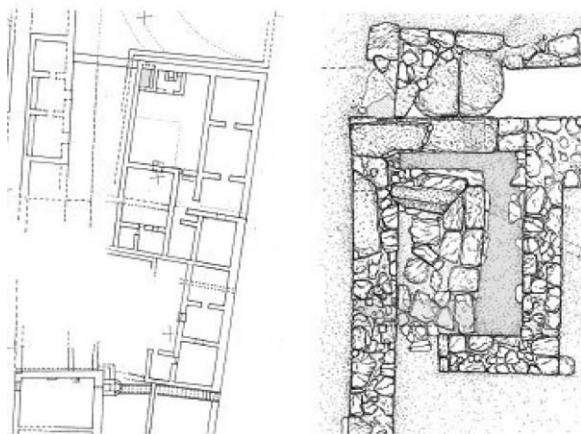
Ithidiki's residence-Minoa Amorgos (a) General plan; (b) Detailed plan
